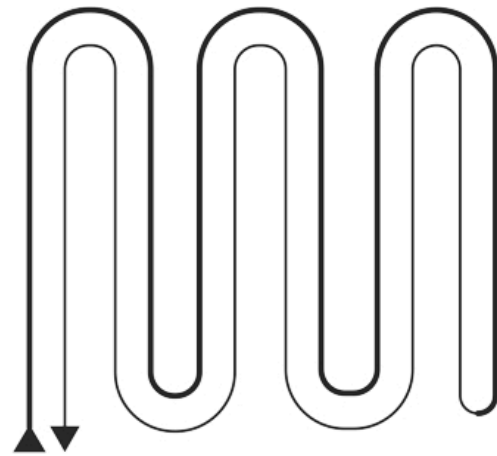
Tubing pattern for rooms with four or no outside walls (“counterflow”)
